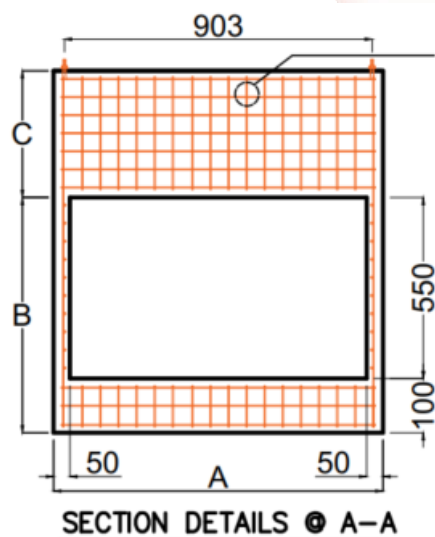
Layout Details of Precast Concrete Base for the Service Cabinet
